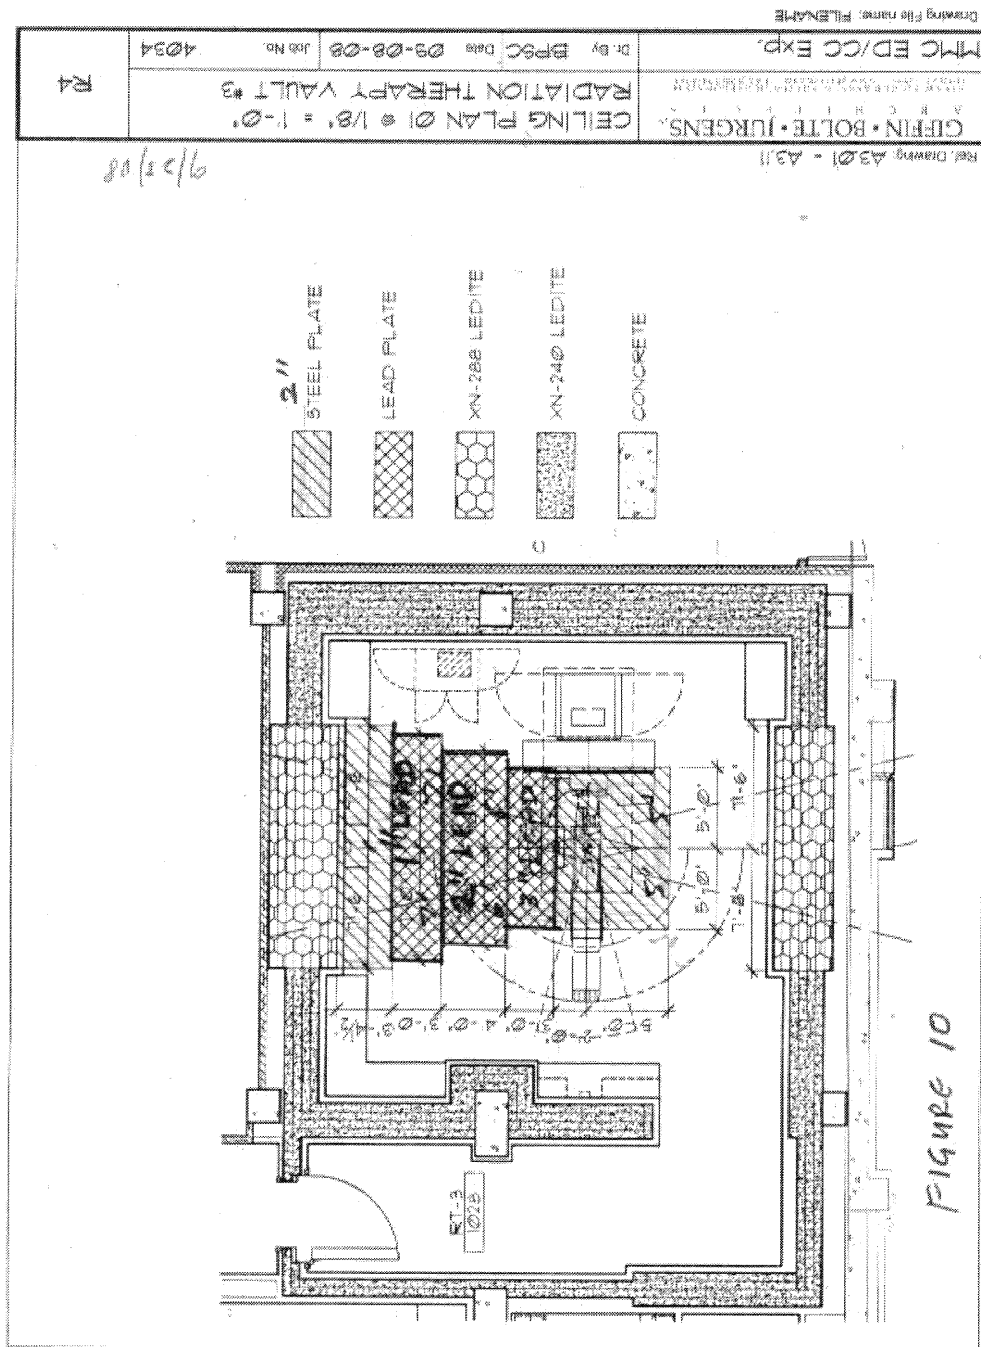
Ceiling Plan and Required Shielding for Linac Vault (Lead and Steel)
